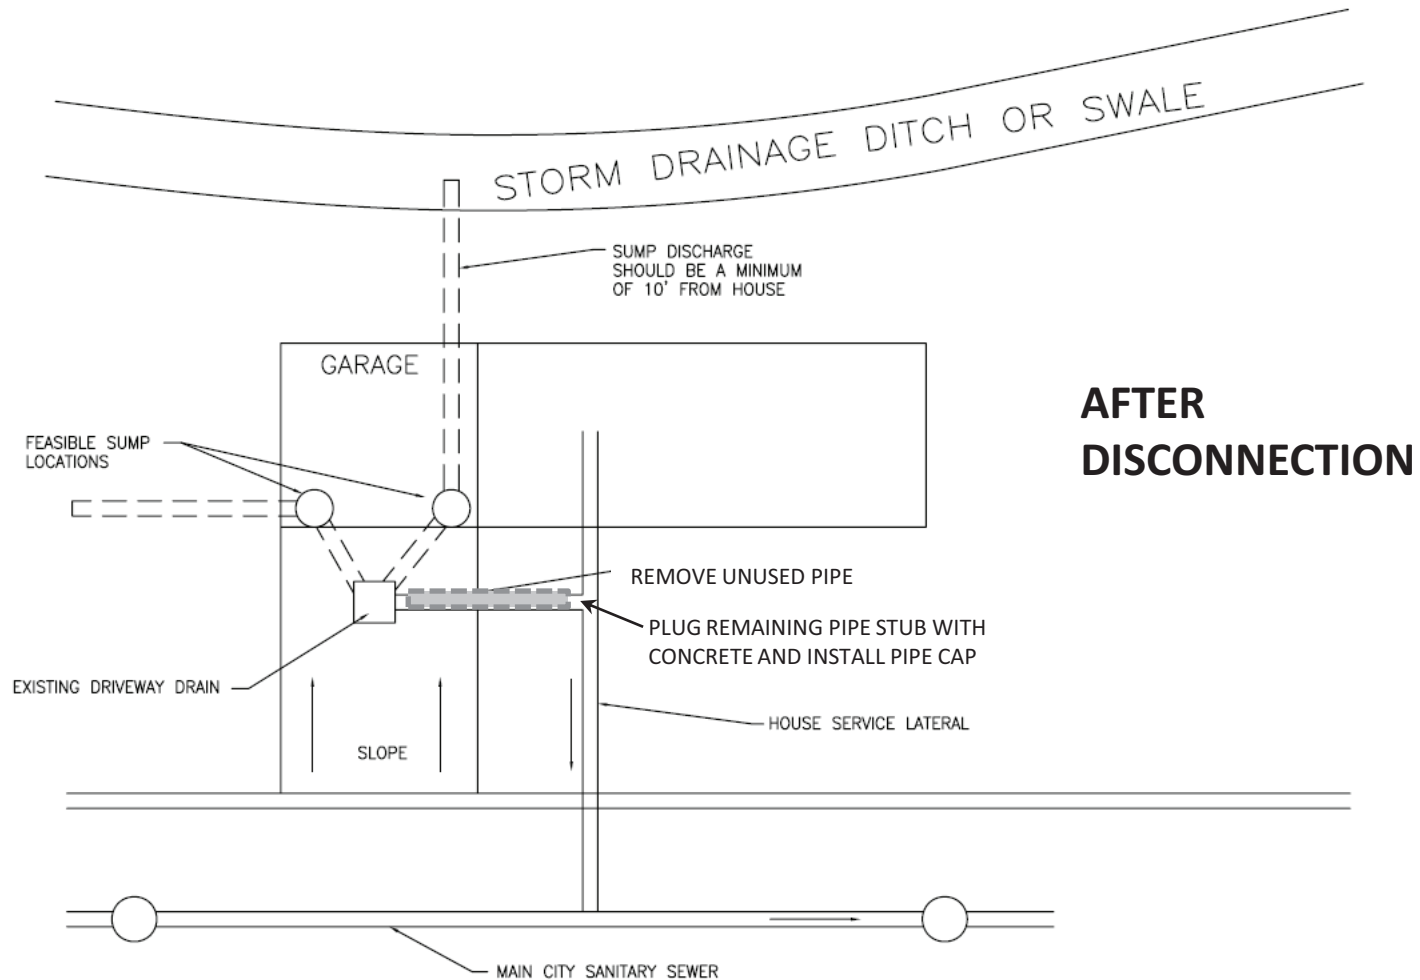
DRIVEWAY/AREA DRAIN DISCONNECTION
